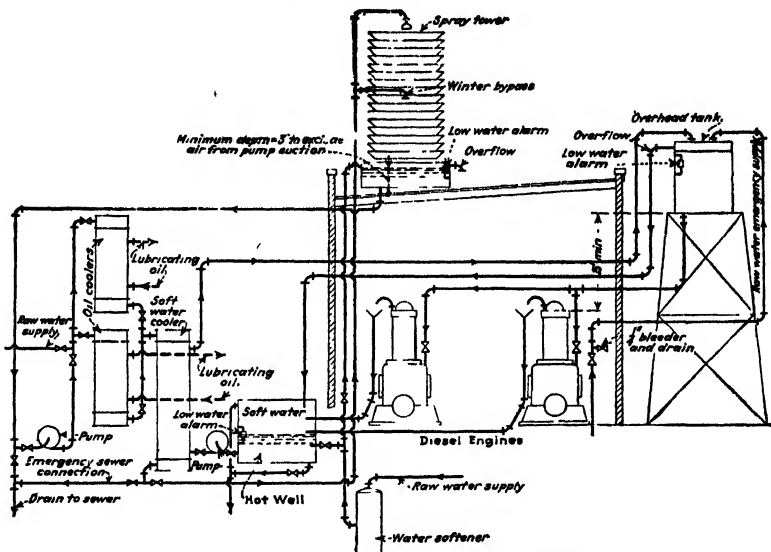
Cooling-water system with spray tower, heat exchanger, and softener for make-up water.
